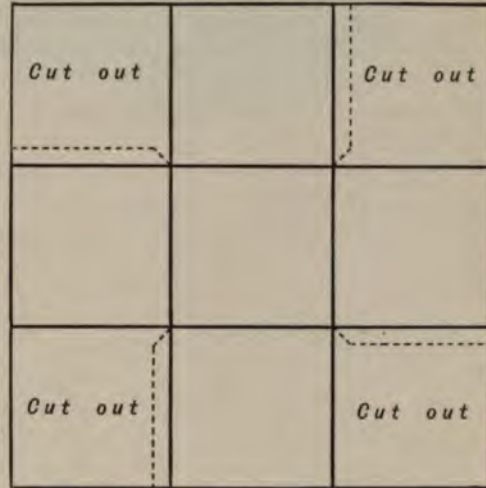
Method of setting-out the Lead for a Cesspool with Soldered Seams
